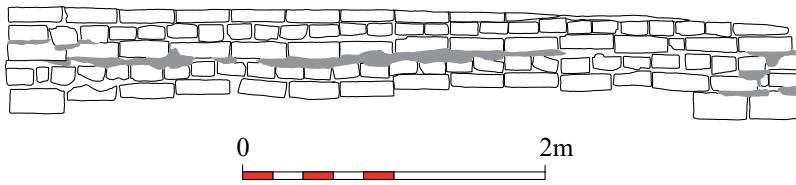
Building Z1. Elevation of the east face of wall (ZH5)6 (scale 1:50).
